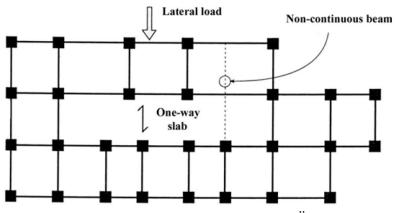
Over-Stretched One-way Slab (Özmen, 2008)
